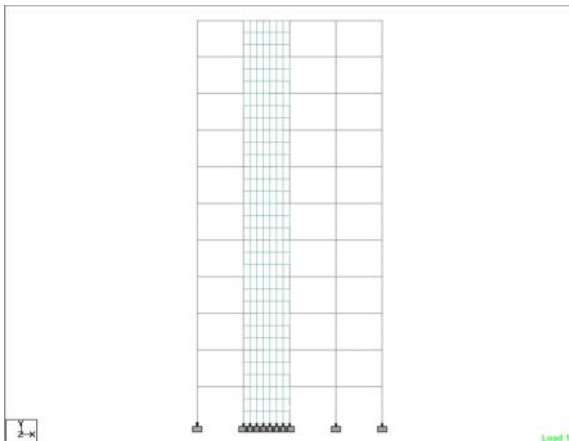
shows front elevation showing columns and beam frames, shearwall, fixed supports.
